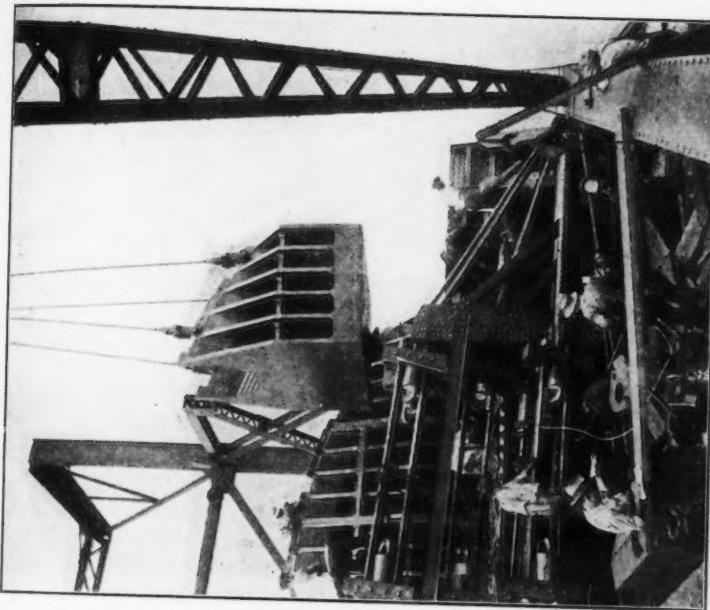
ERECTING TOWER SADDLE CASTINGS.
